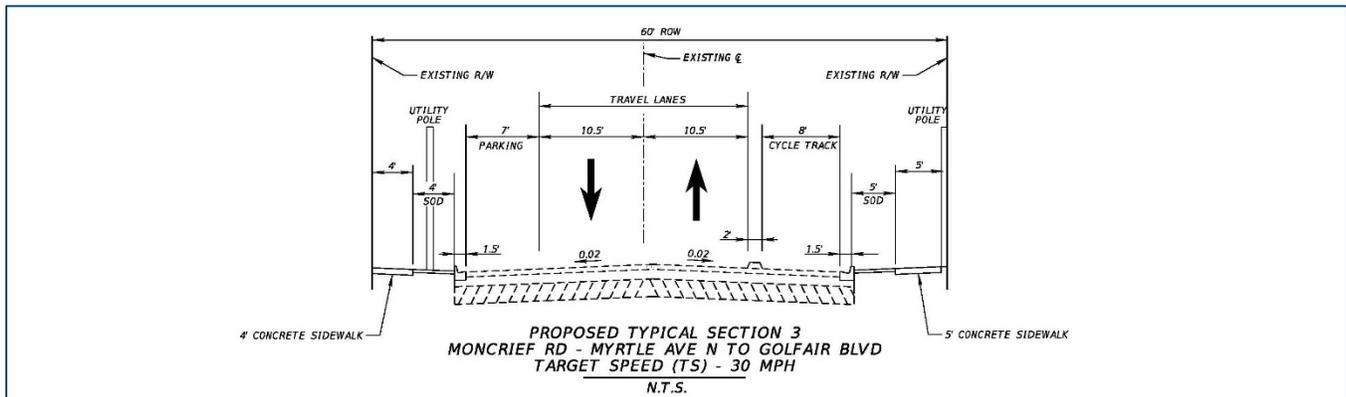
Proposed Typical Section (Myrtle Avenue to Golfair Boulevard)
